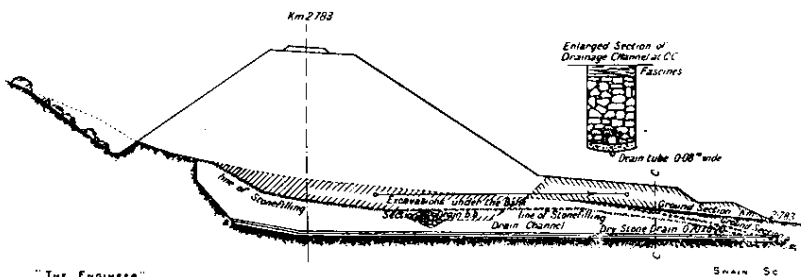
CROSS SECTION OF EMBANKMENT AT KM. 2.73
